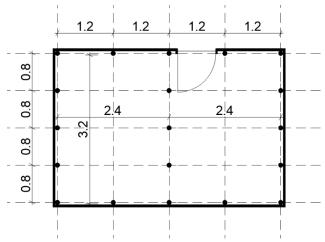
Kutaplalong shelters floor plan (UNHCR, 2021)
